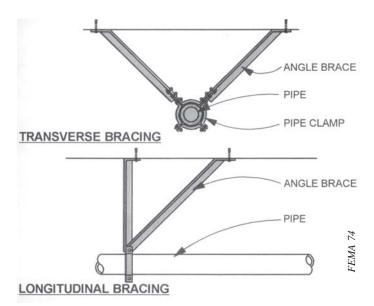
Bracing Pipes. Adding diagonal braces to keep pipes from swaying can prevent damage and disruption.
